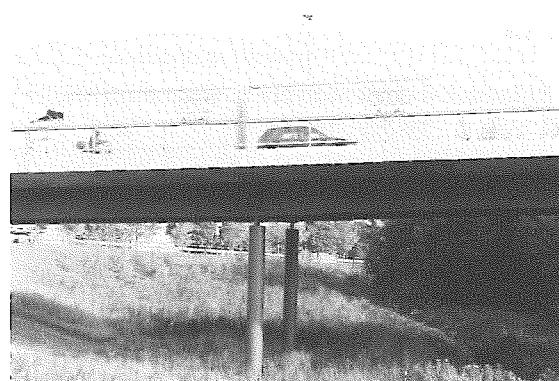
Composite bridge near Ingolstadt, Germany
